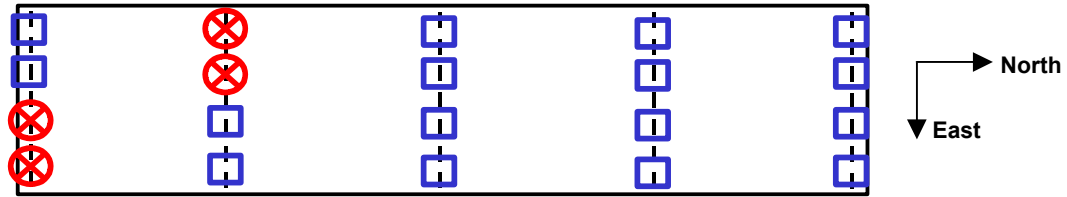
Locations of failed puddle welds after Test #7 (DDR = 1.11 %)
